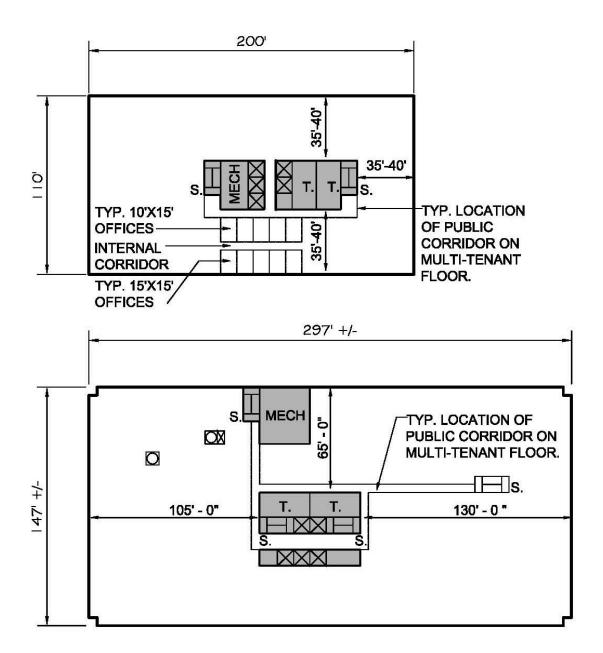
Comparison of typical office building floor plan (100' x 200' for 20,000 GSF floor plate) and Mayflower Building typical floor plan (147' x 297' with 44,000 GSF floor plate).
